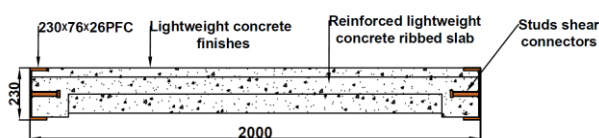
Schematic drawing of a cross-section of the new flooring system.
